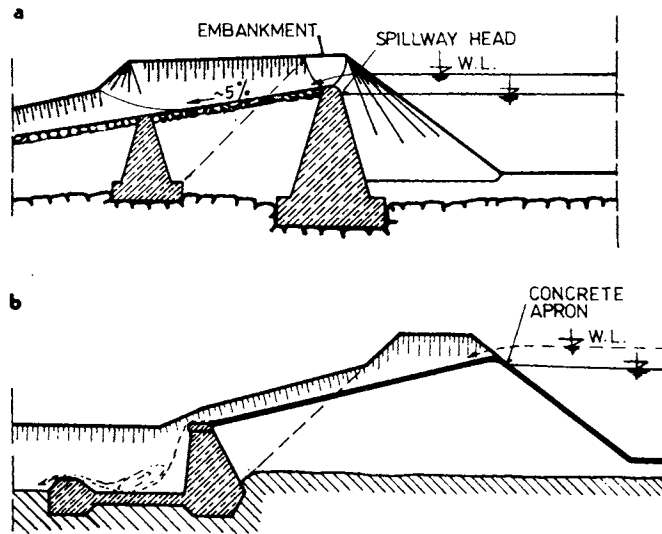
The side overflow with concrete structures. a — concrete wall, b — concrete lining.
